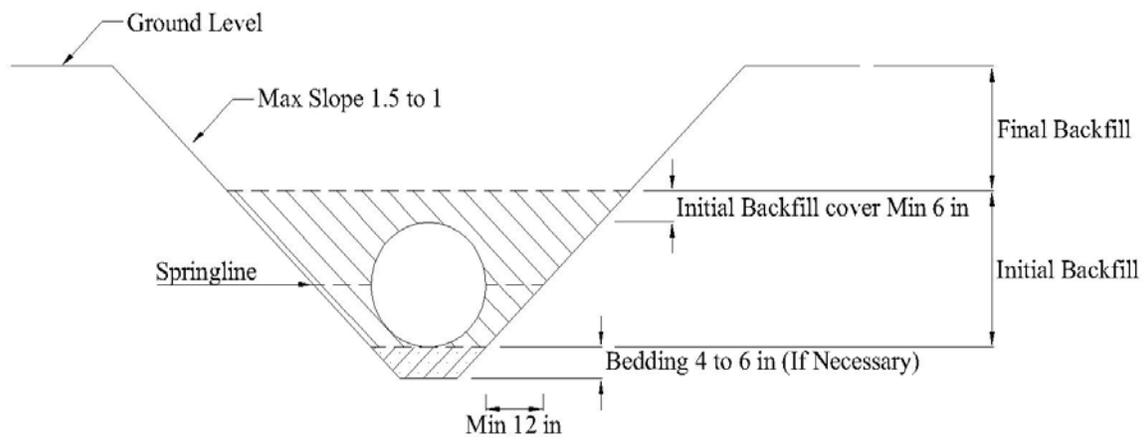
Trench Depth 5 to 12 feet: Sloped walls
